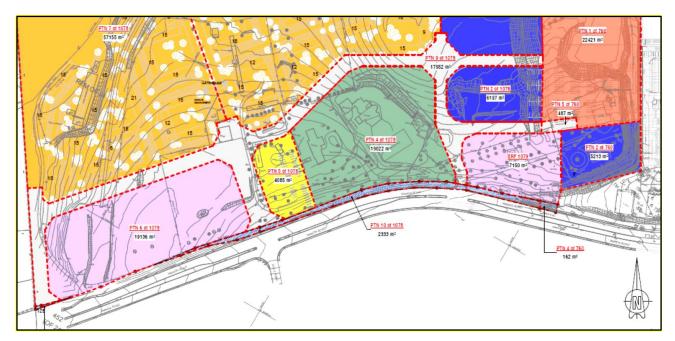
Access to the site from Inanda Road (Refer to the master plan at Annex H)
